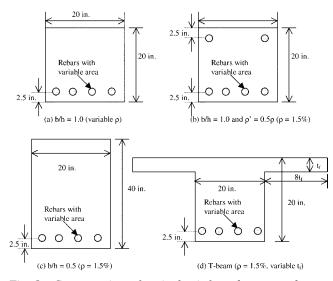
Cross section of typical reinforced concrete beams considered in parametric study.
